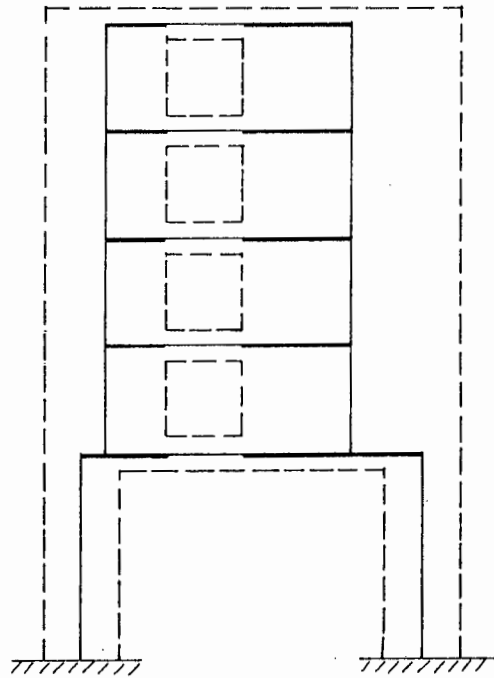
Frame Idealization Method - Typical Subdivision into Elements
